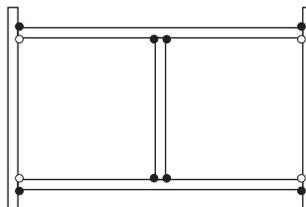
Arc spot welds configuration using only one spot in the outer joints.
